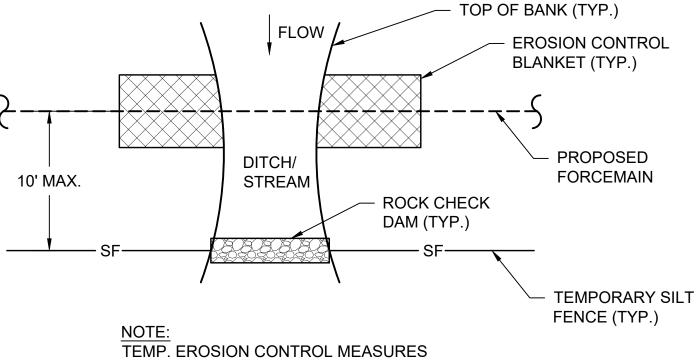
DETAIL - HORIZONTAL DIRECTIONAL DRILL "FRAC-OUT" CONTINGENCY PLAN
